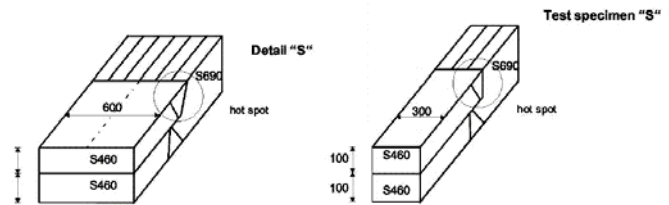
Details of connection of thick plates made of S460 and S690 for testing
